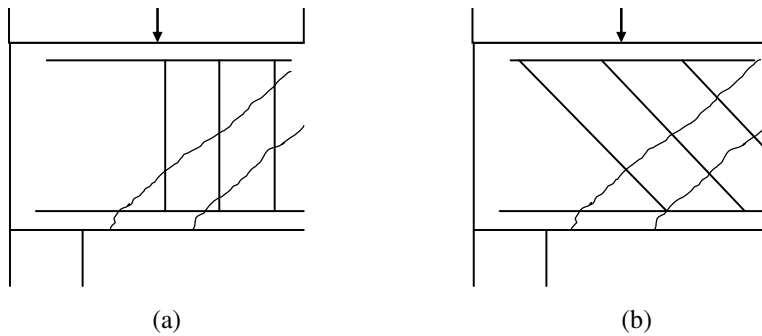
Alternative arrangements of shear reinforcement in reinforced concrete beam (a) vertical shear reinforcement mounted perpendicular to the main tensile reinforcement (b) inclined shear reinforcement placed perpendicular to the cracks.
